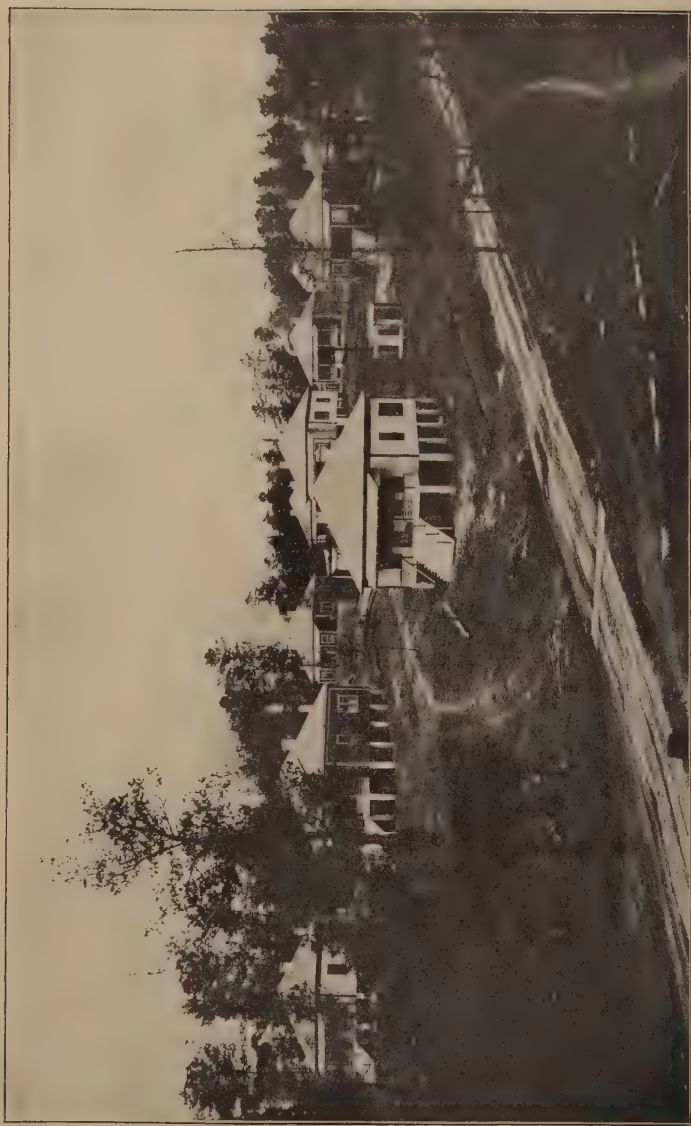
New coal mining camp, Birmingham (Ala.) district, constructed in 1916. Houses built before grading and laying of streets. All cottages of similar plan and adapted for conversion into double houses. Used as 1-family 4-room houses. Running water in kitchen; electric light. Coiled inside; composition roof.
